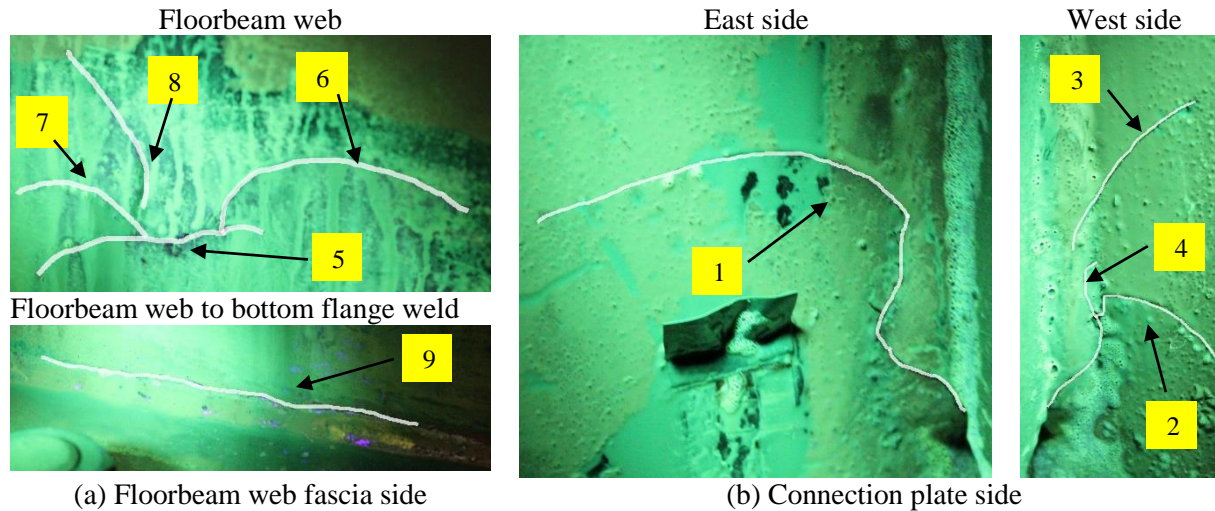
Cracks on single-plate connection specimen (FS1)
